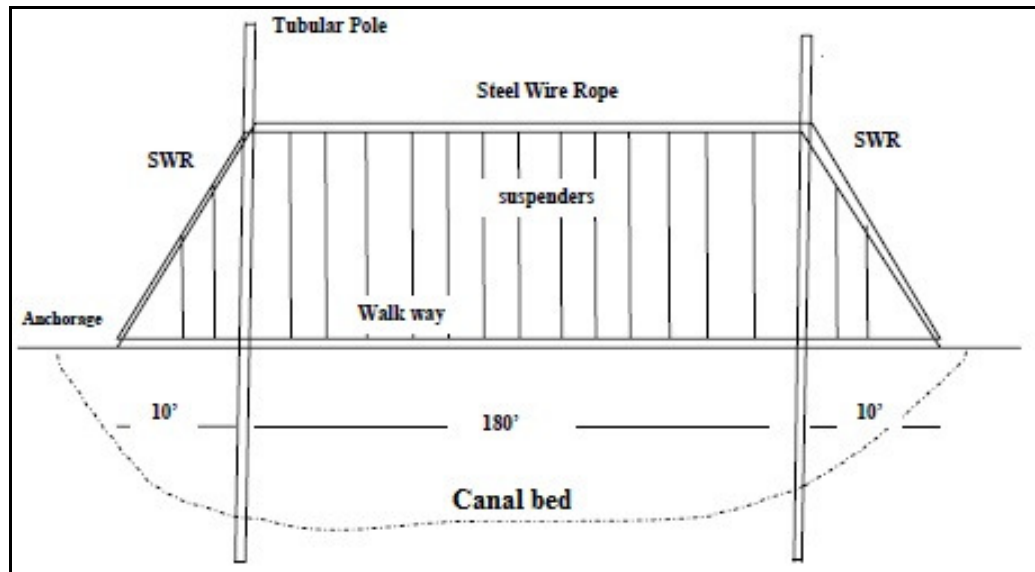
Typical design of a foot suspension bridge for Oussudu sanctuary
